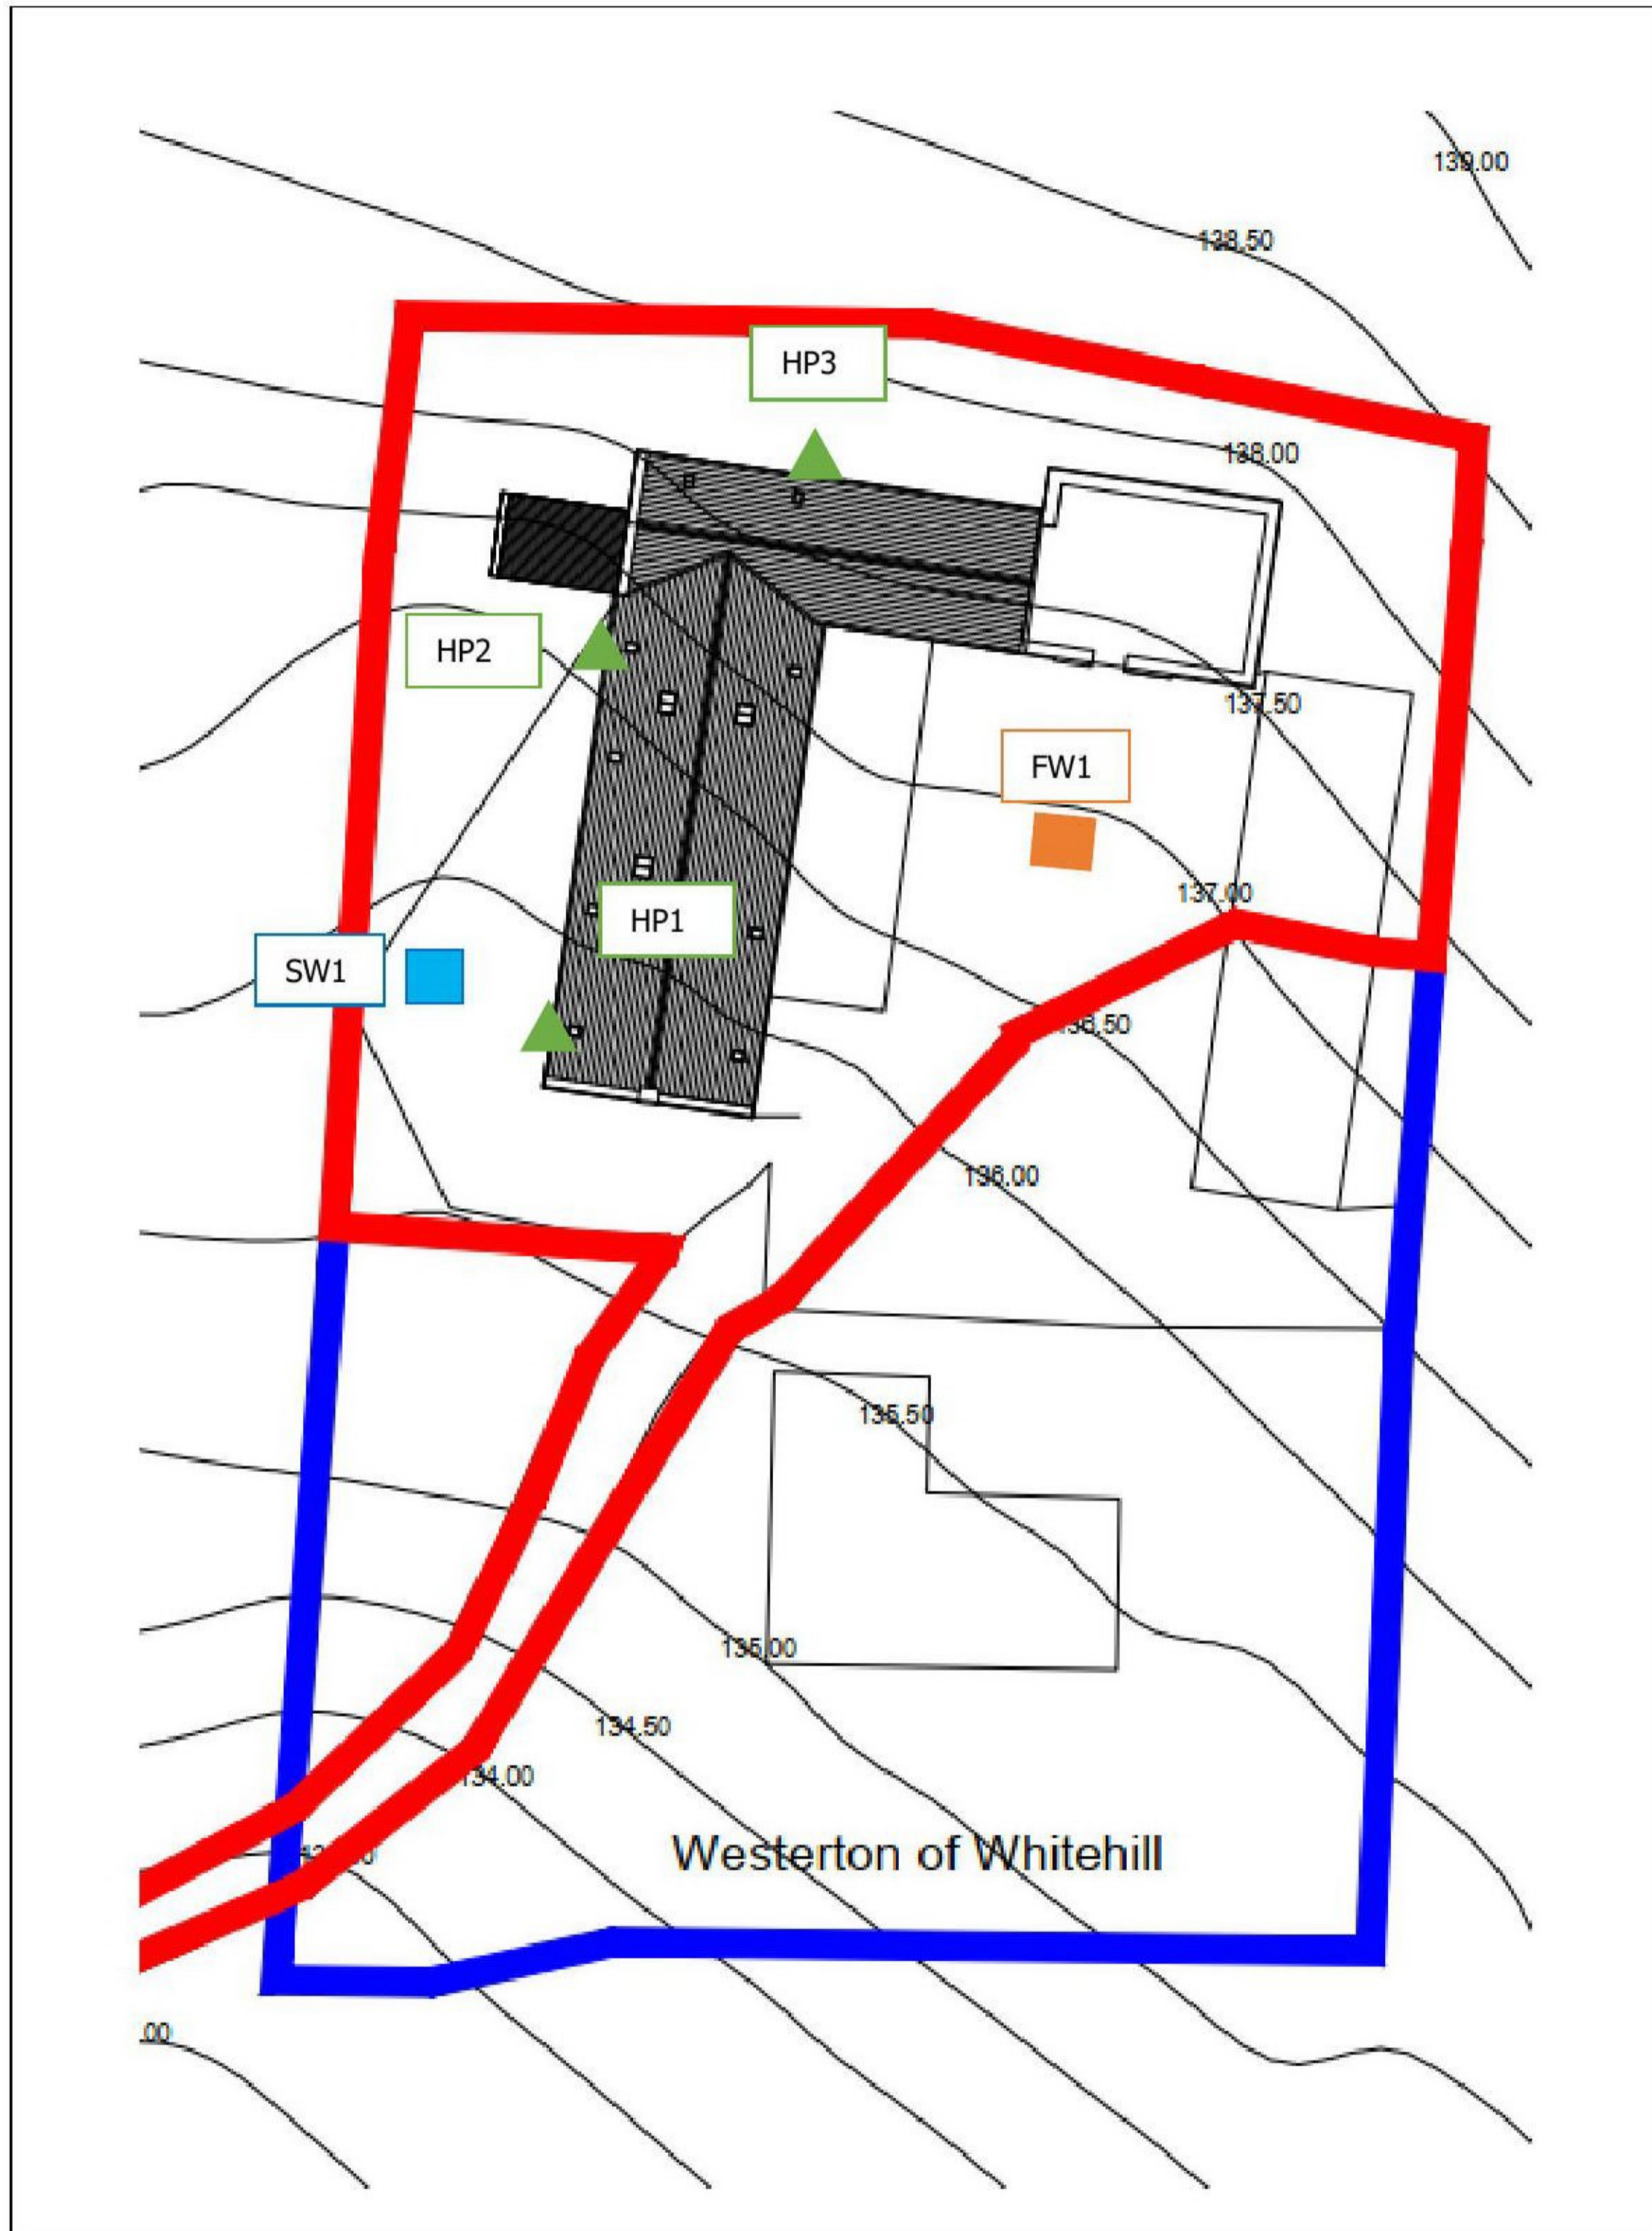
INDICATIVE DRAINAGE LAYOUT
